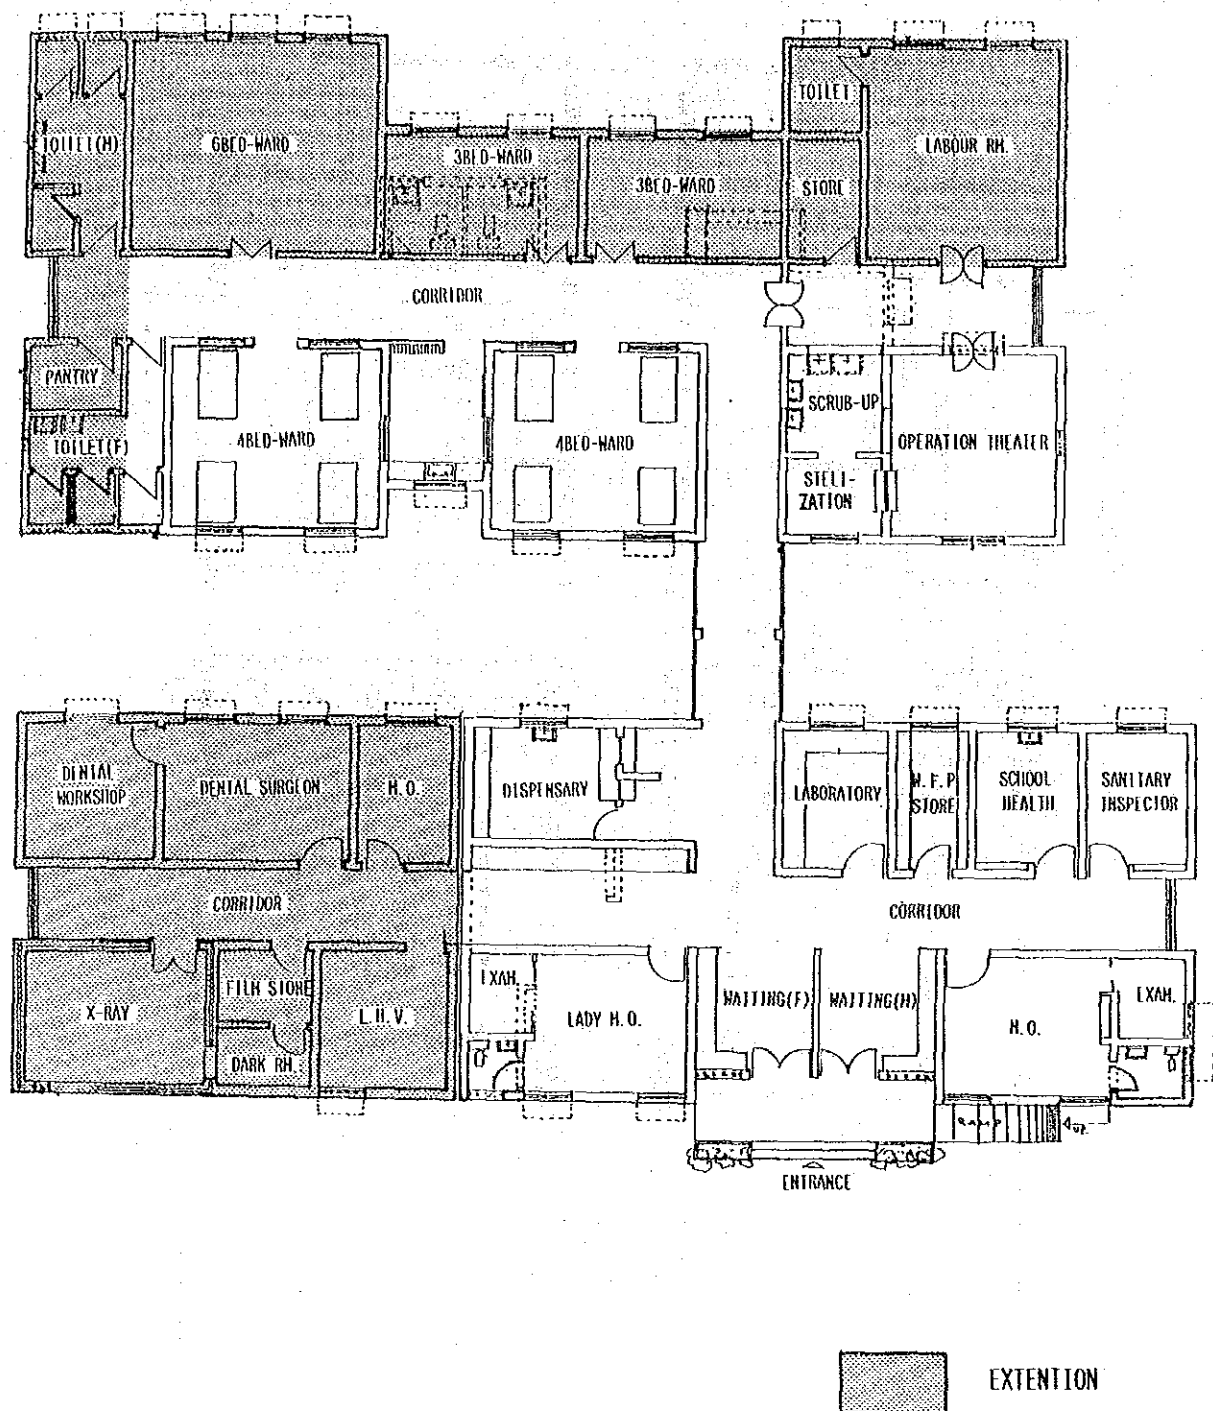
Proposed Floor Plan for Newly Constructed BHU
